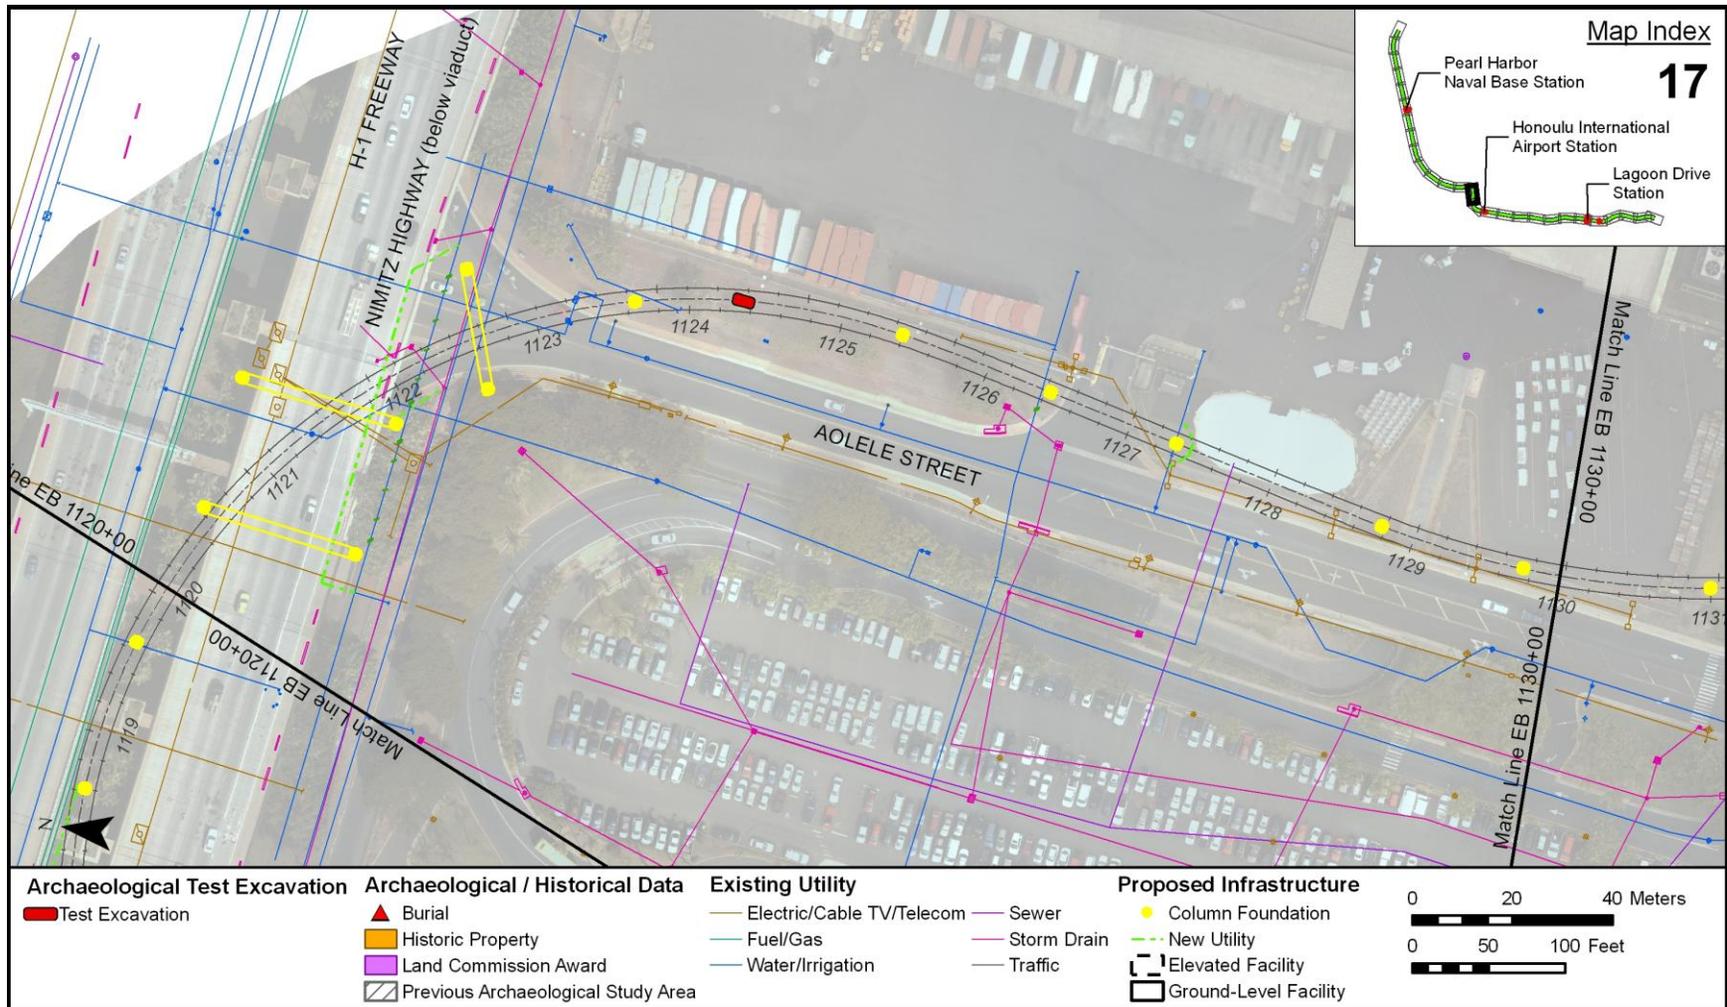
Map Sheet J 17, one 10x3 excavation at column foundation @ 1124+ 30
